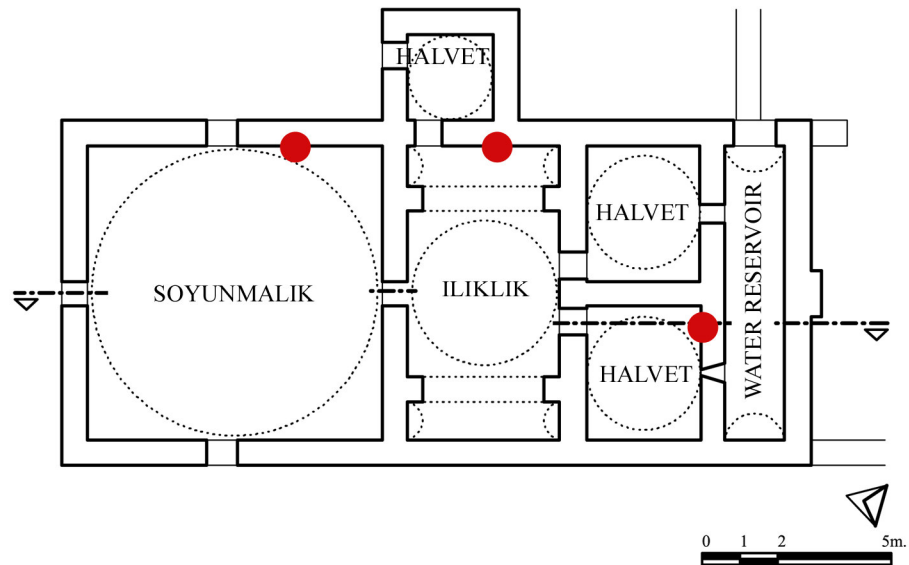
Plan of Düzce Bath showing where the samples were collected
